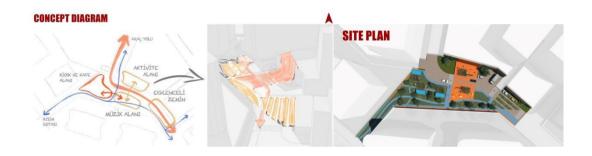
Case Study I, Playable Art Street Design Concept Diagram and Site Plan
